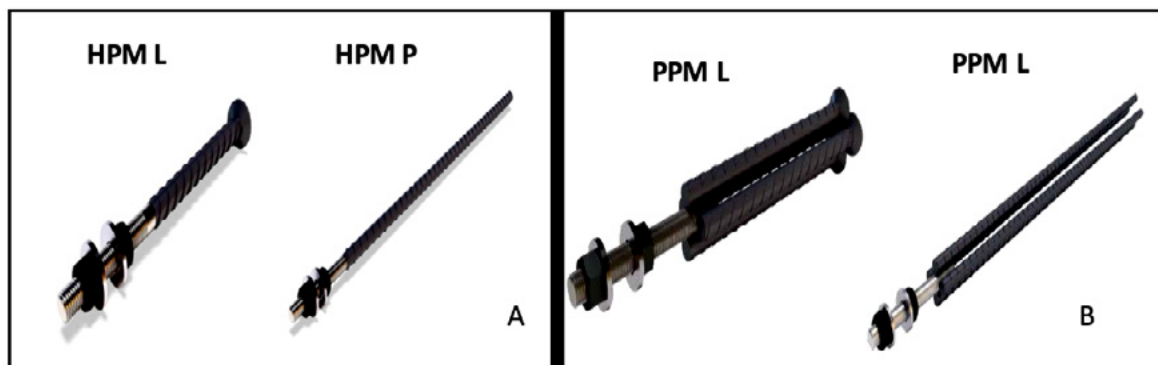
Anchor bolts. A) HPM Rebar Anchor Bolts Type L & type P [15]. B) High Strength Steel Anchor Bolts Type (L & P) [16]
